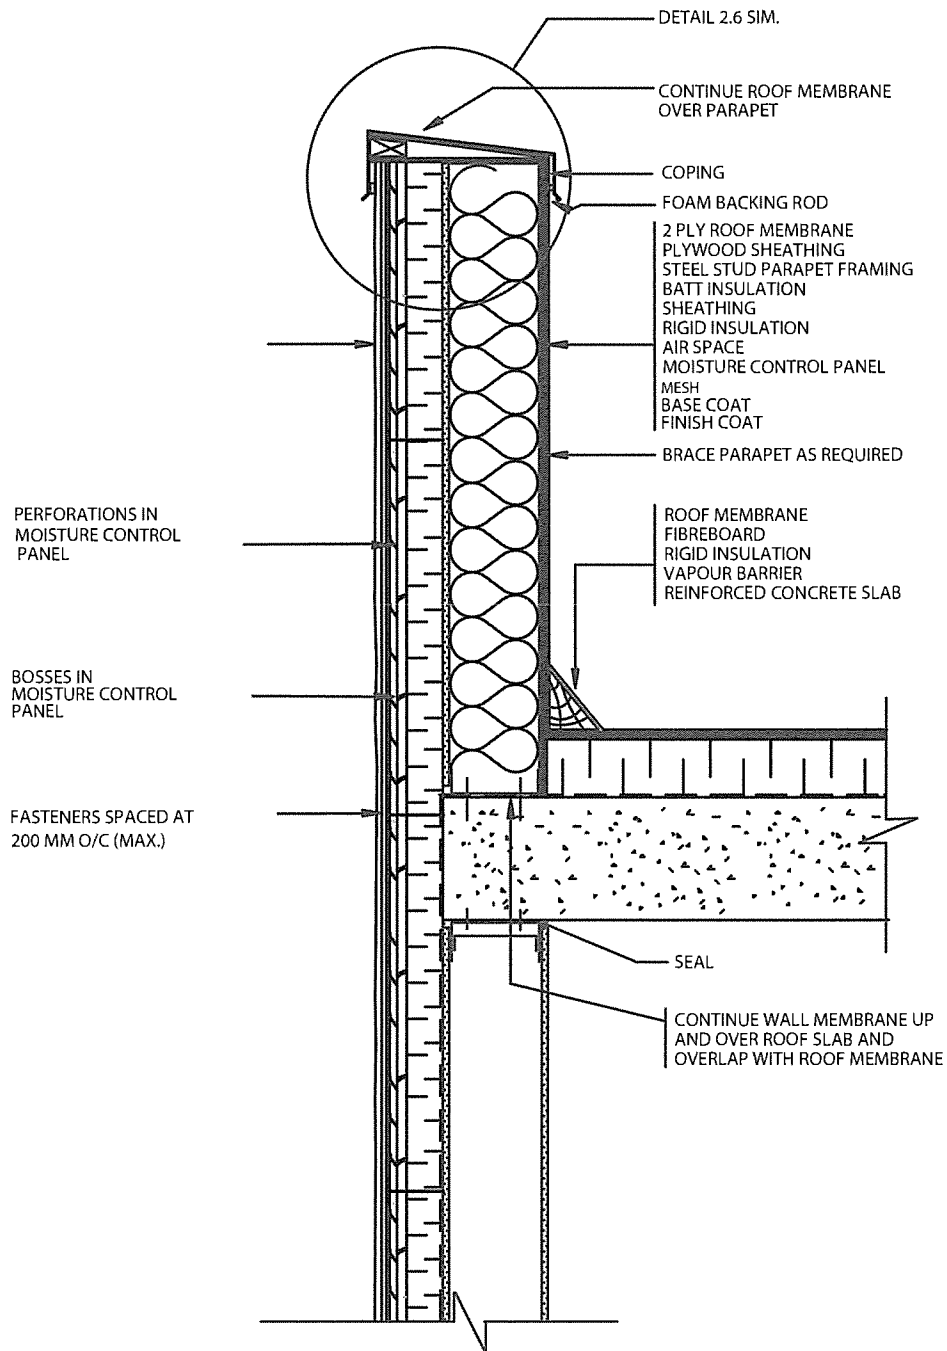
ACRYLIC STUCCO / STEEL STUD
